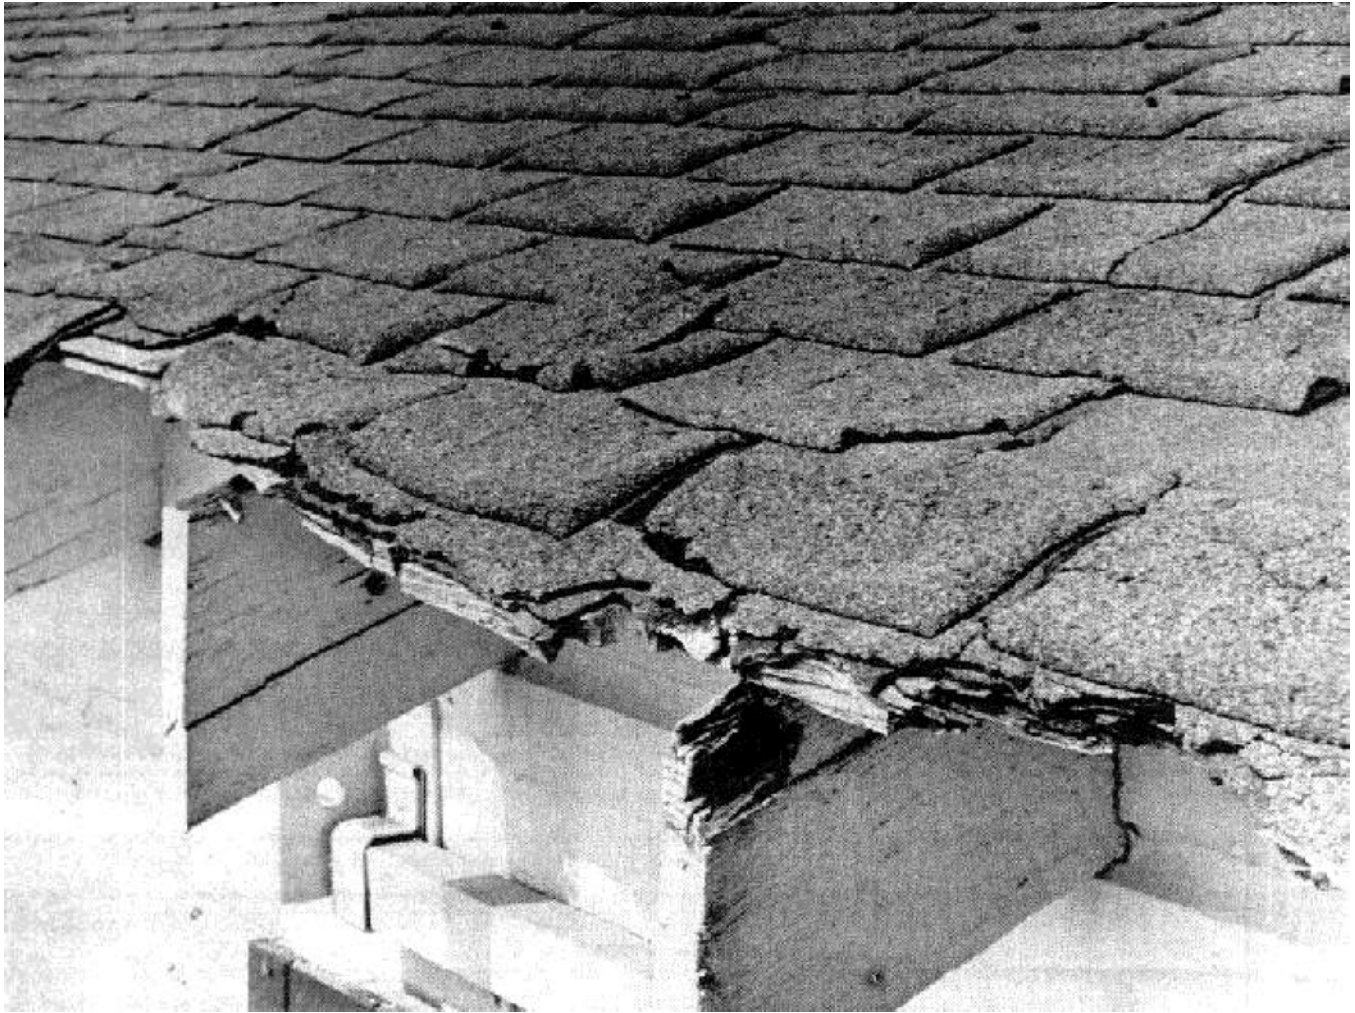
Inadequate provision for drip at eave — note damage to roof deck.
